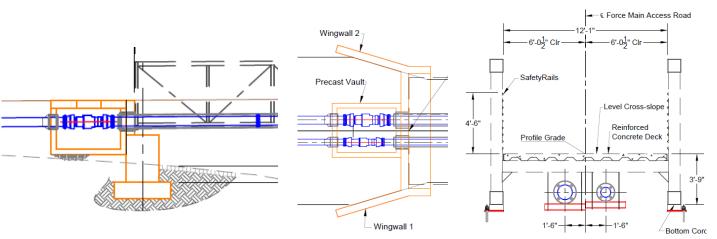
Sample Pedestrian Bridge with Individual Casings (3rd pipe not shown)
